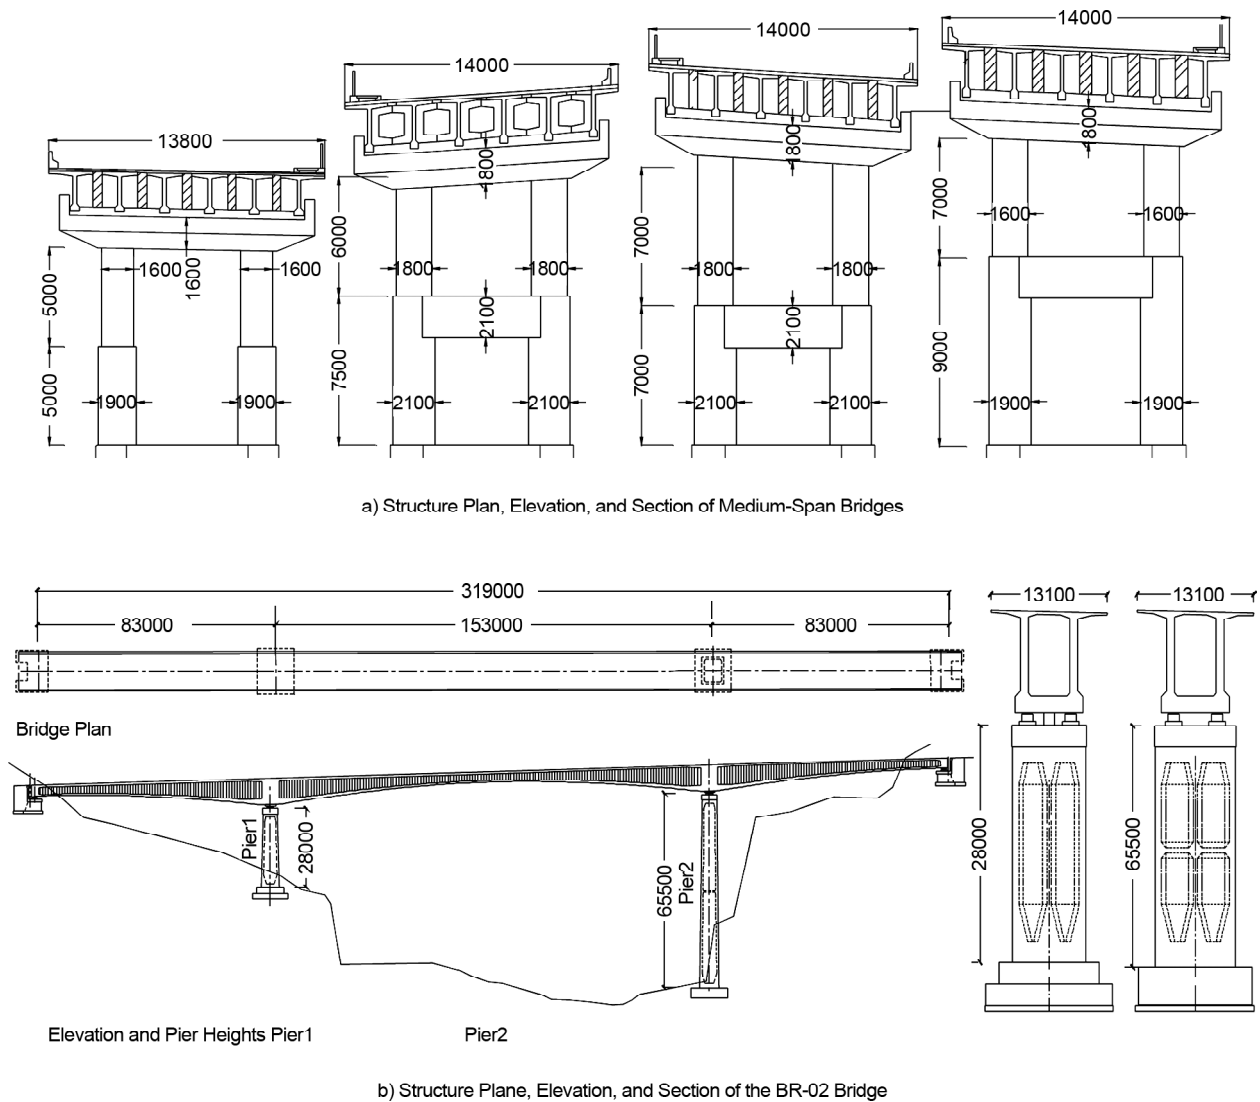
Geometry of the bridges (Dimensions in millimetre).
